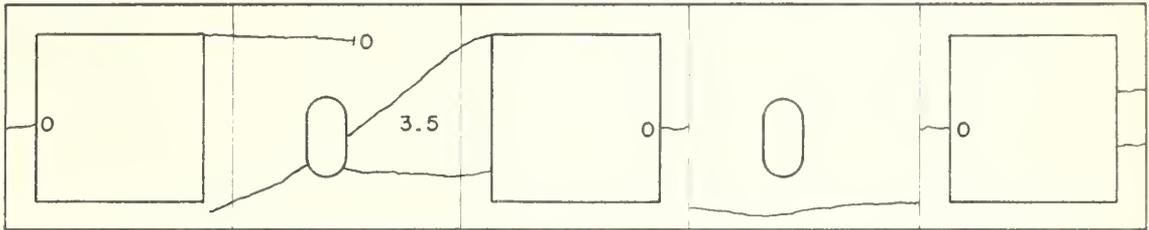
CRACK PATTERN IN BEAMS NO. 7 & 8
